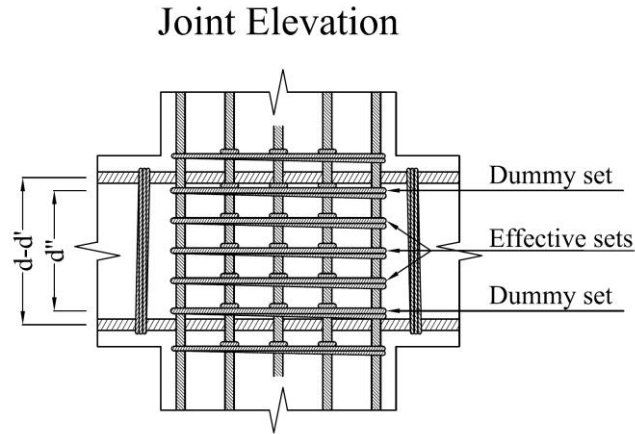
Schematic view of the effective zone for placing the joint shear reinforcement
